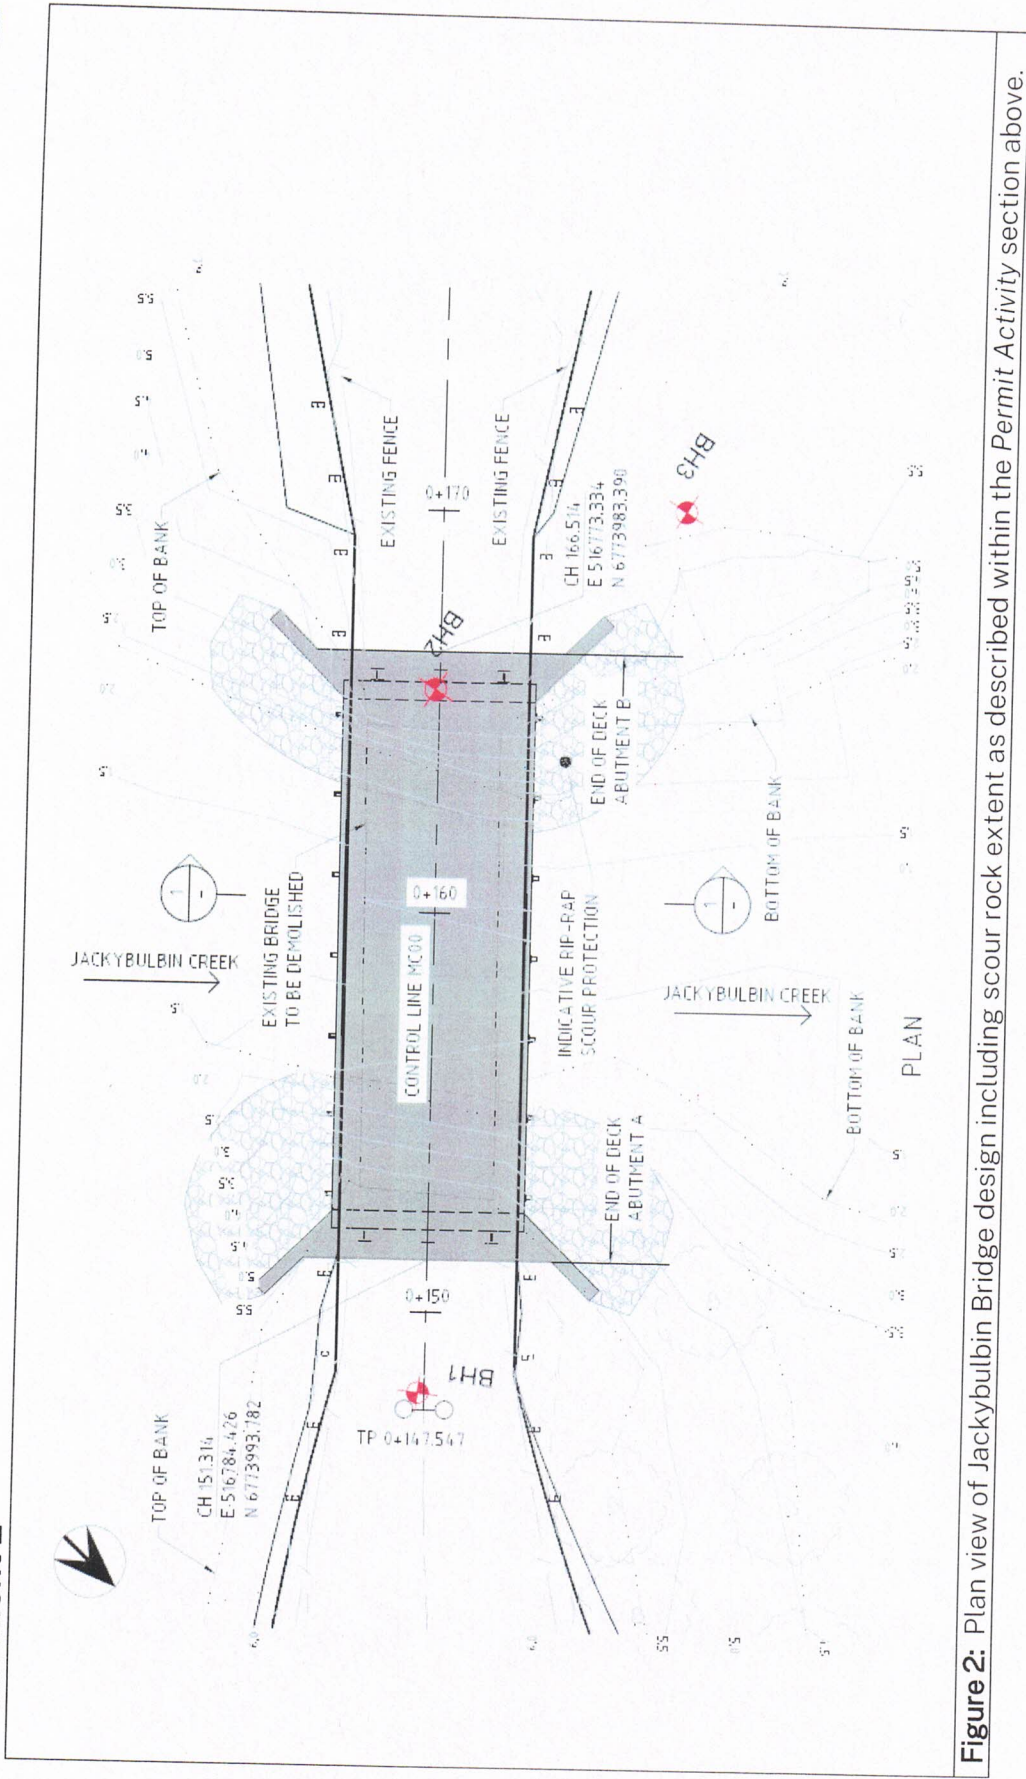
Plan view of Jackybulbin Bridge design including scour rock extent as described within the Permit Activity section above.
